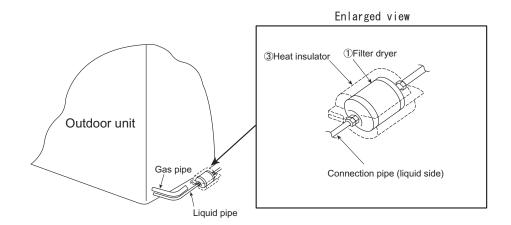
Filter dryer attachment diagram (horizontal attachment in unit)
